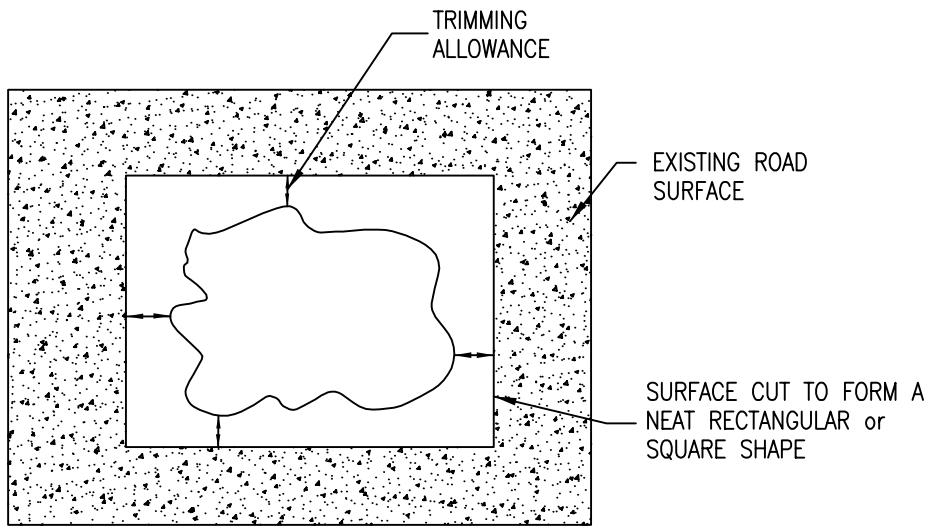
FINISHING OF IRREGULAR SHAPED EXCAVATIONS
